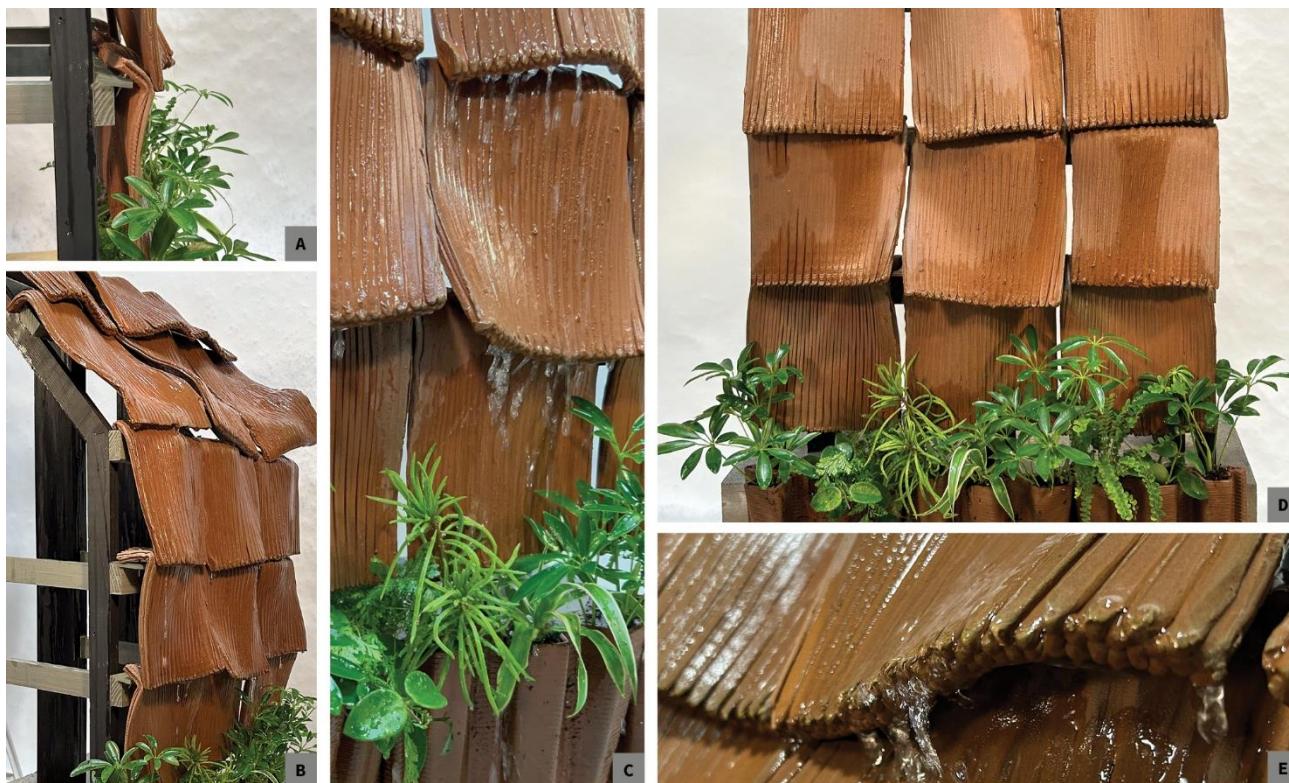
(A) close-up of the tile attachment. (B) side view of the entire assembly. (C) water moving across the tiles. (D) front view of the tiles as they dry. (E) close image of the water passing over the tiles.
